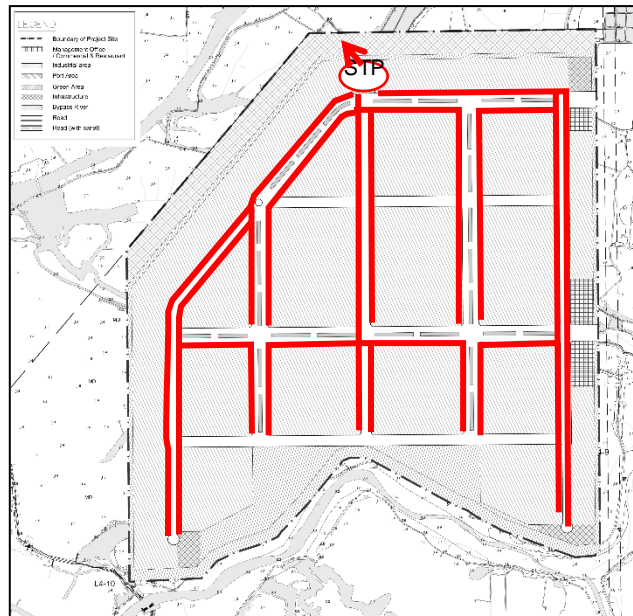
(3)-4 Sewage treatment plan General EZ
